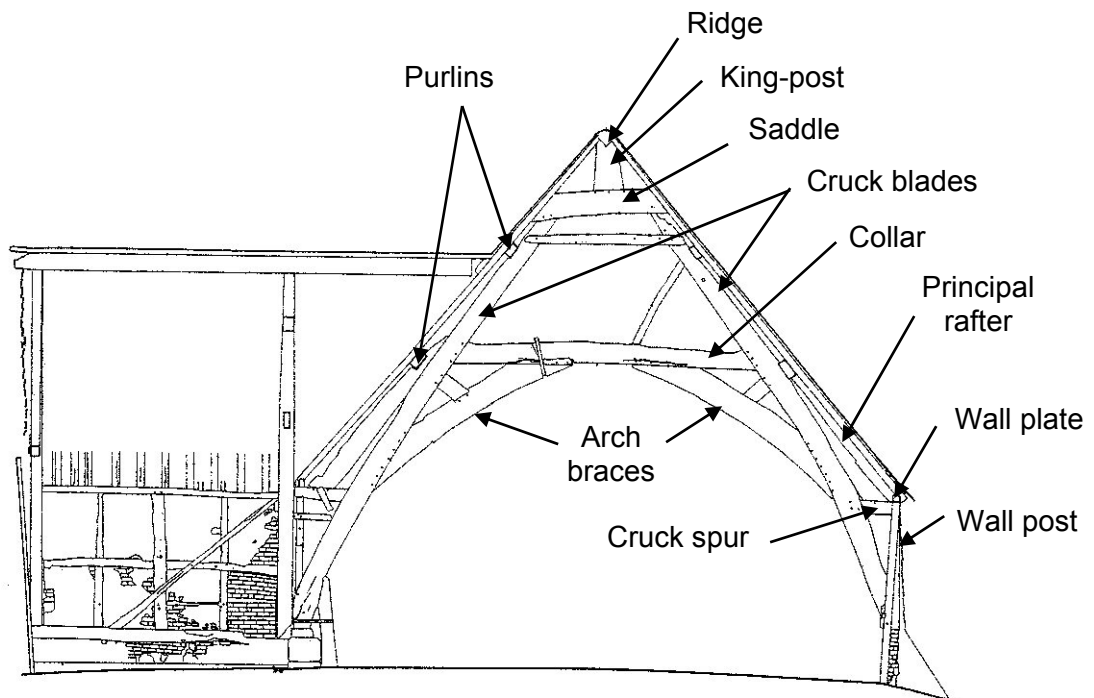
Typical truss from Leigh Court Barn, Leigh, Worcestershire, in this case showing Truss 3 from the main barn in elevation, and T12 and T13 from the western porch in section. Viewed from the lower, east, face of the truss hence hiding the lap joints for the cruck spurs (based on a survey by Plowman Craven and Associates supplied by English Heritage). The nomenclature for structural elements used in this report is given here, scale c 1:140
